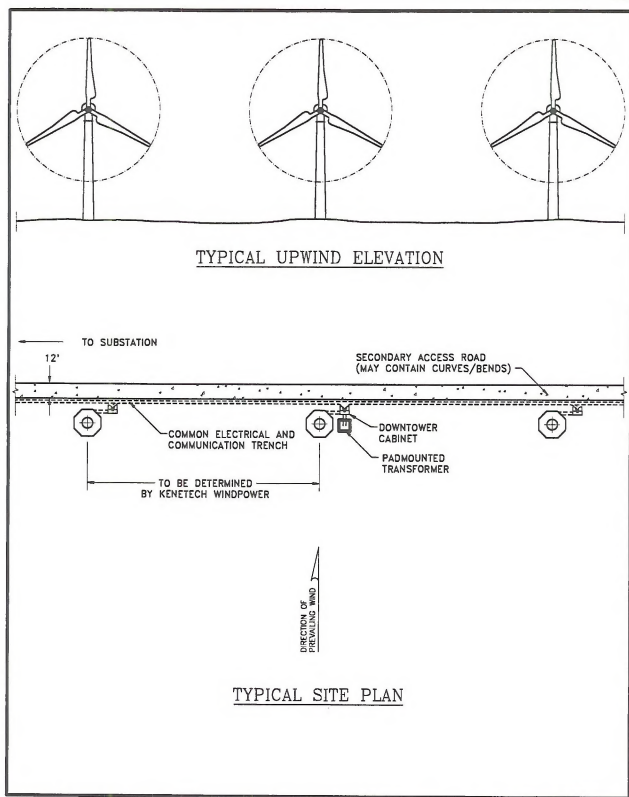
Typical Site Plan of Turbine String Corridors and Roads.
